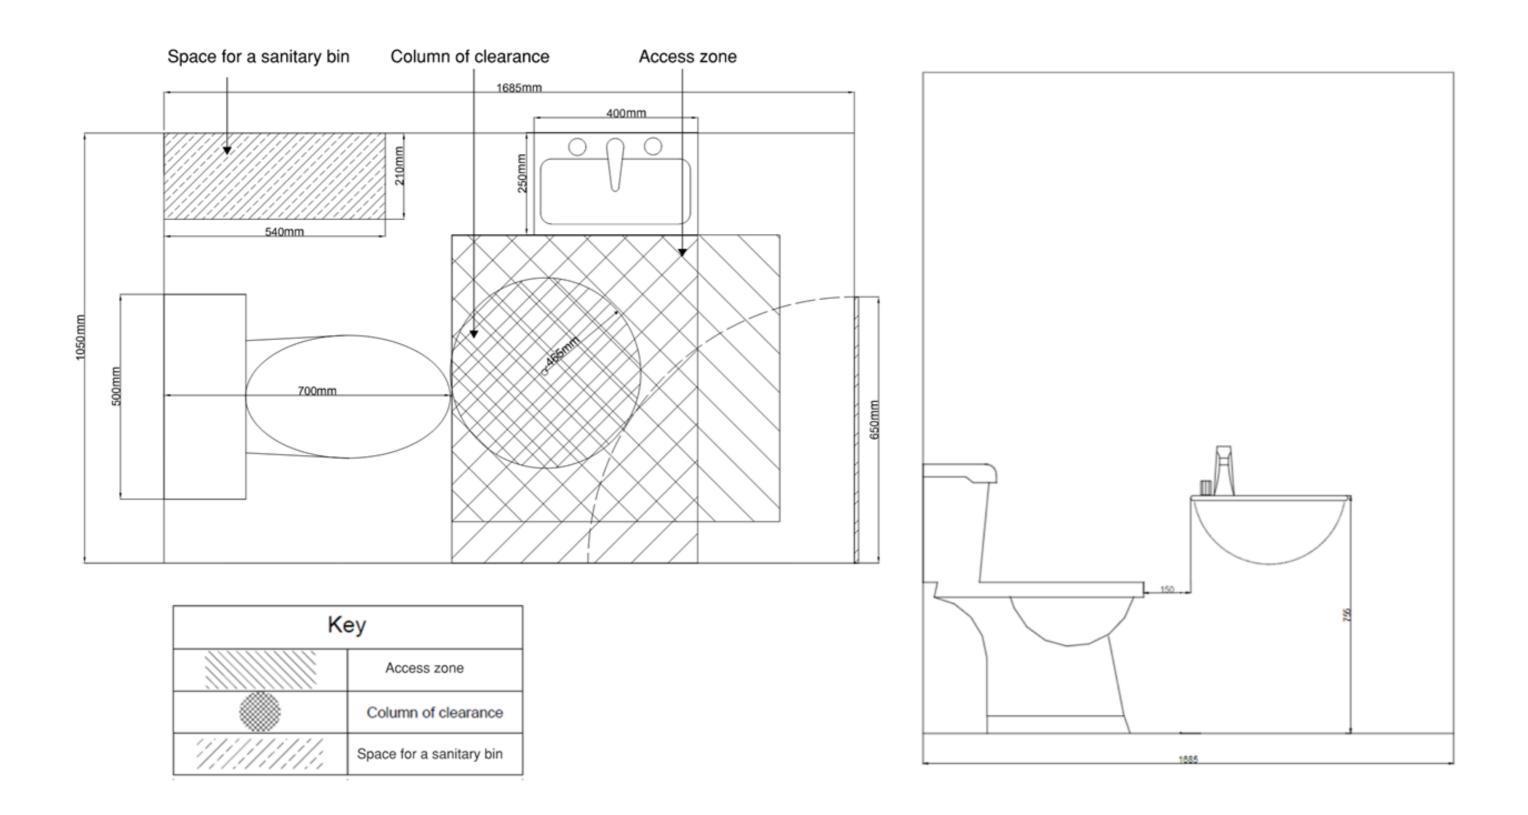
Indicative diagram for standard toilet cubicle with basin (plan and elevation).
